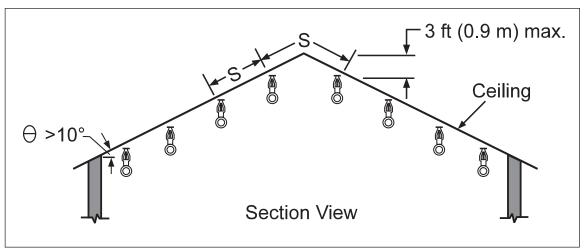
Location of storage sprinklers if ceiling slope exceeds 10°
